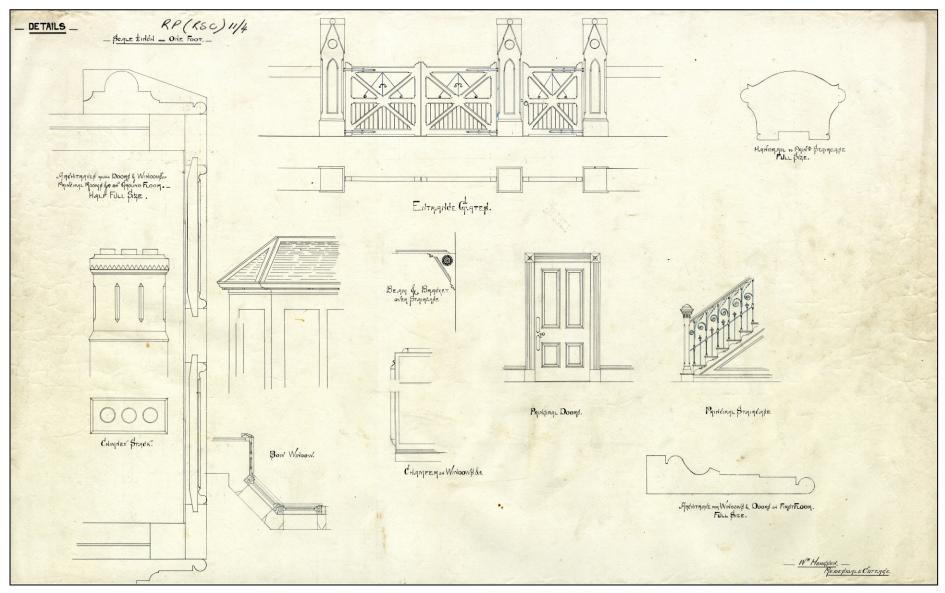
Architectural notes and sketches relating to the construction of a parsonage at Horsley (ROC_M&D 029)
